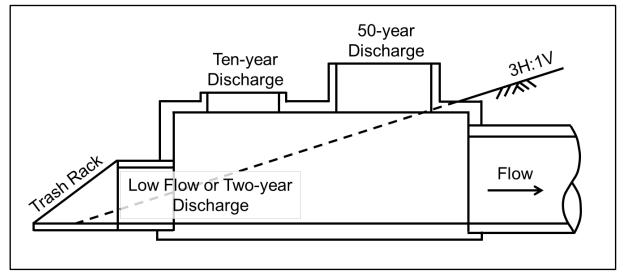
Cross-Sectional Profile View of Multiple-Outlet Structure with Example Flows Specified
